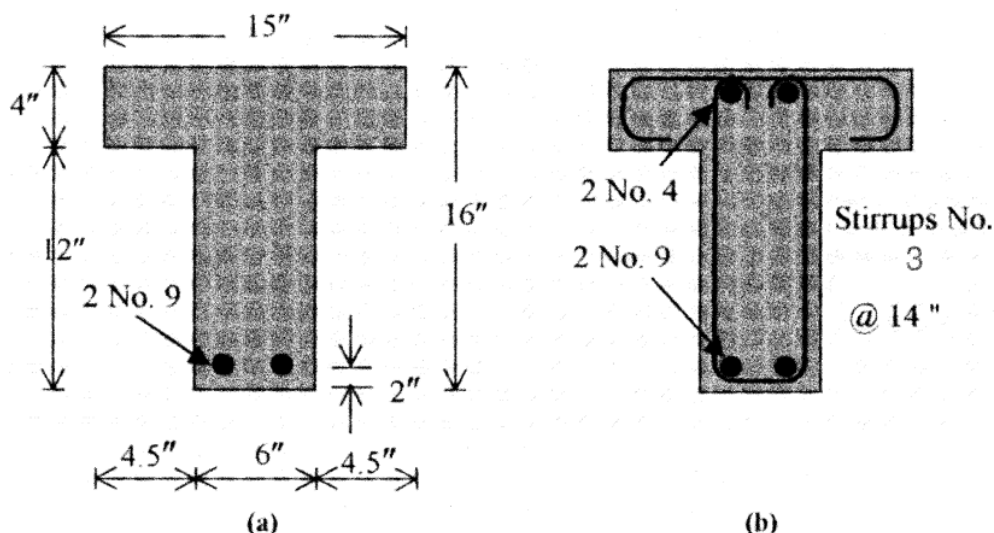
Cross section of beams: (a) beams without stirrups; and (b) beams with stirrups (De Lorenzis and Nanni, 2001) - dimensions in inches.
